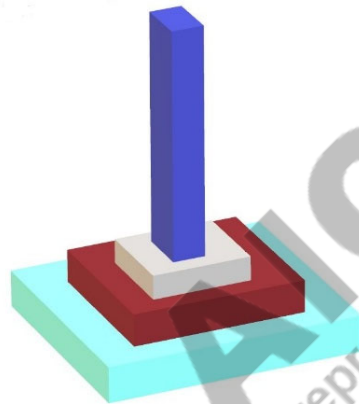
(c). Single column footingFig 2.7 (d). Details of plan of single footing
